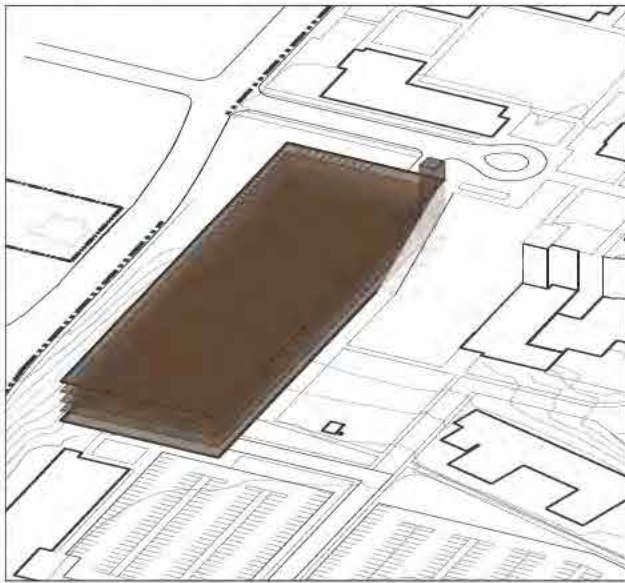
Axonometric and Site Plan of new five level parking structure
